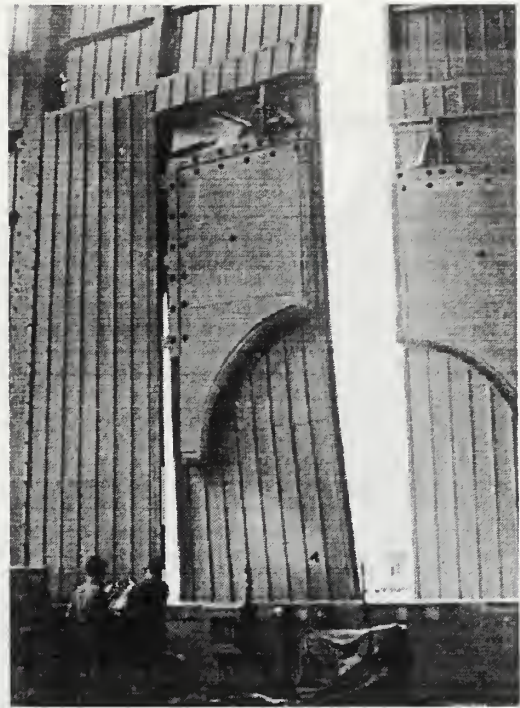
Interior Elevation of Damaged Hangar Door
